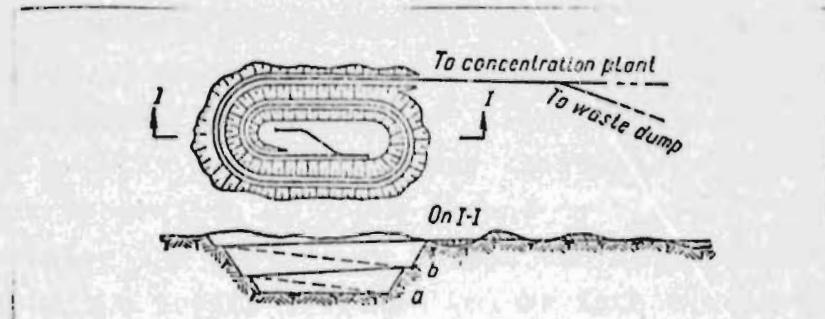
Spiral road layout in a pit (from Shevyakov, p. 655).
